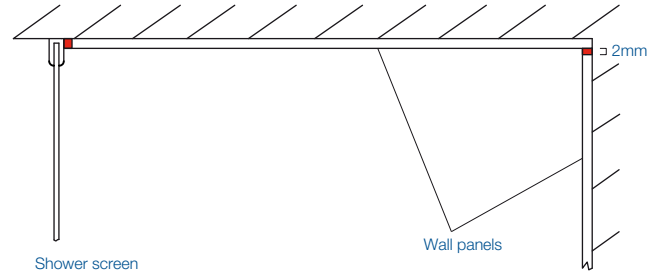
Panelling a shower after the enclosure is fixed without using an internal corner section
